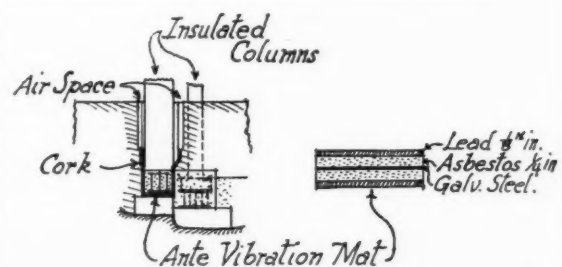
BUILDING COLUMNS INSULATED AT THEIR FOUNDATIONS.
